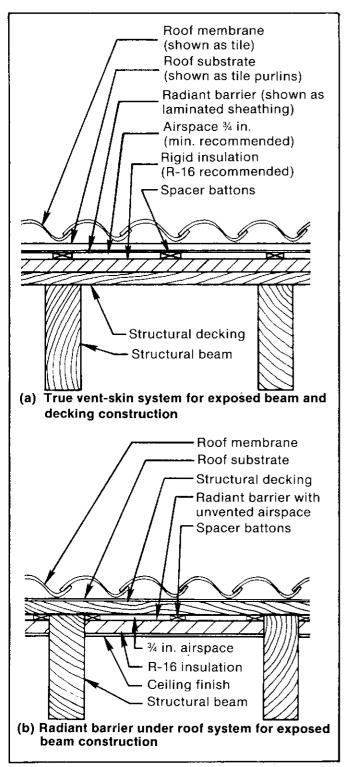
Constructions for Exposed-Beam Cathedral Ceilings
